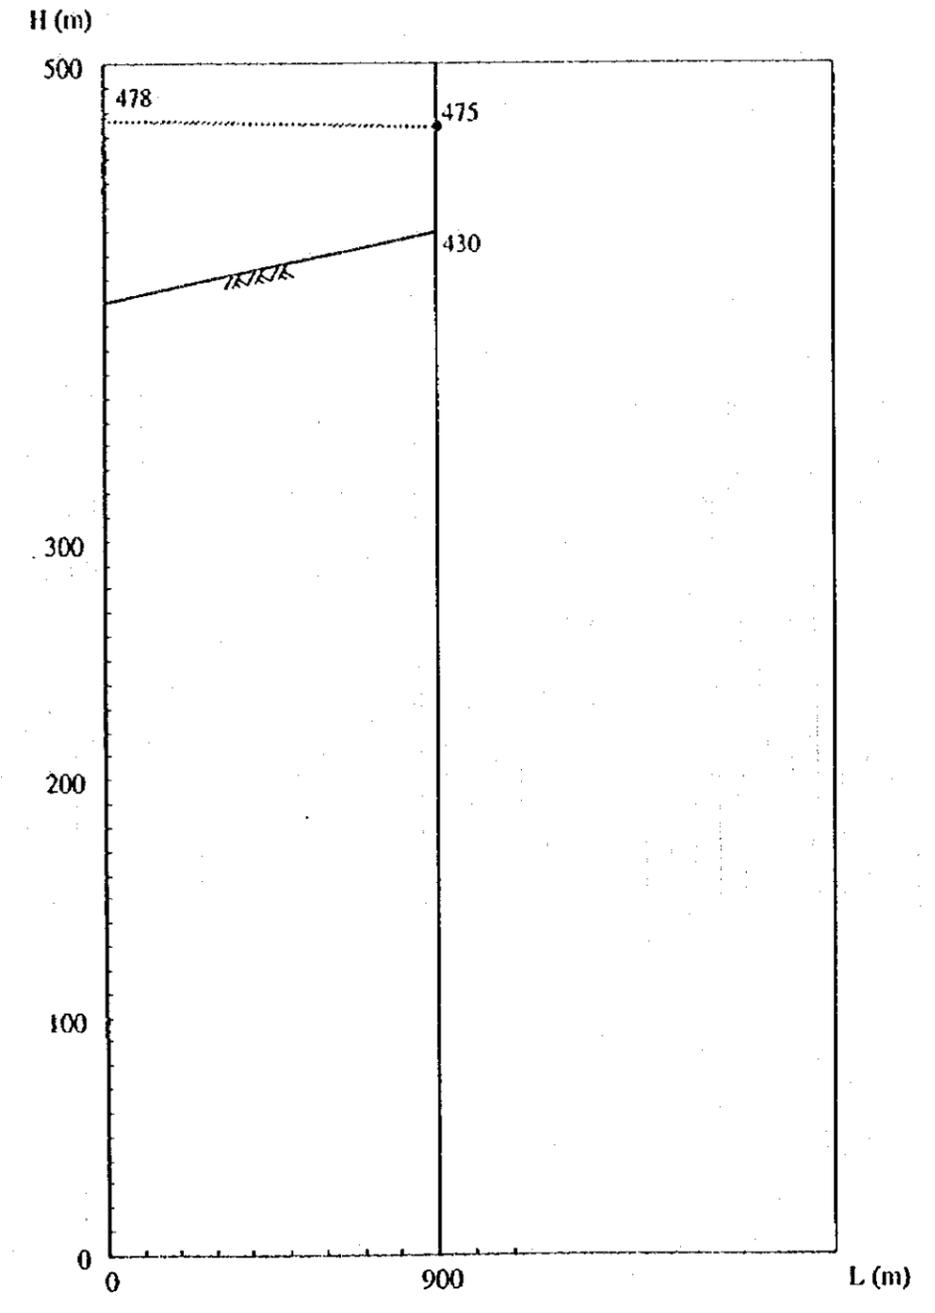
Hydraulic Profile (Teroual) (1/3)
